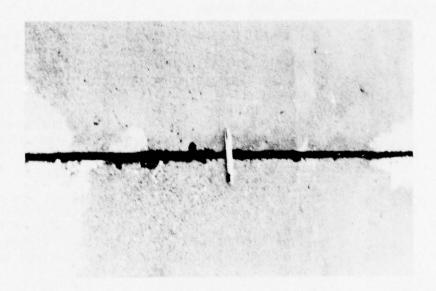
Light Severity Joint Seal Damage. (This Condition Existed Only on a Few Joints in the Pavement Section. If All Joint Sealant Were as Shown, It Would Have Been Rated Medium.)
